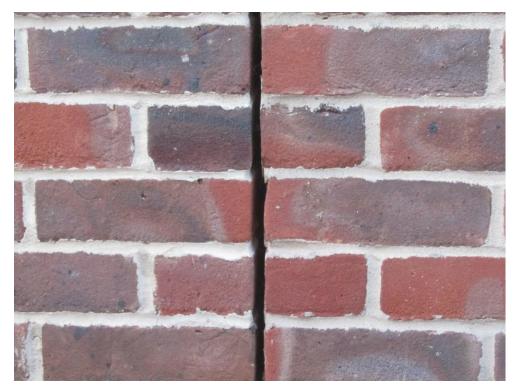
View up close of expansion joint, showing no filling inside the joint.
